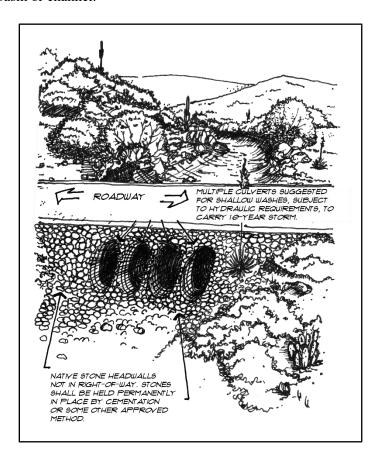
MULTIPLE CULVERTS FOR LARGER DRAINAGEWAYS
